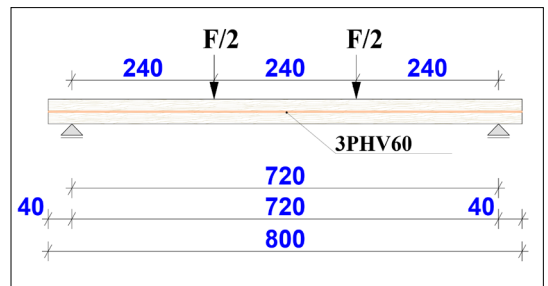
Static model used in the testing of resin-restored wood specimens.
